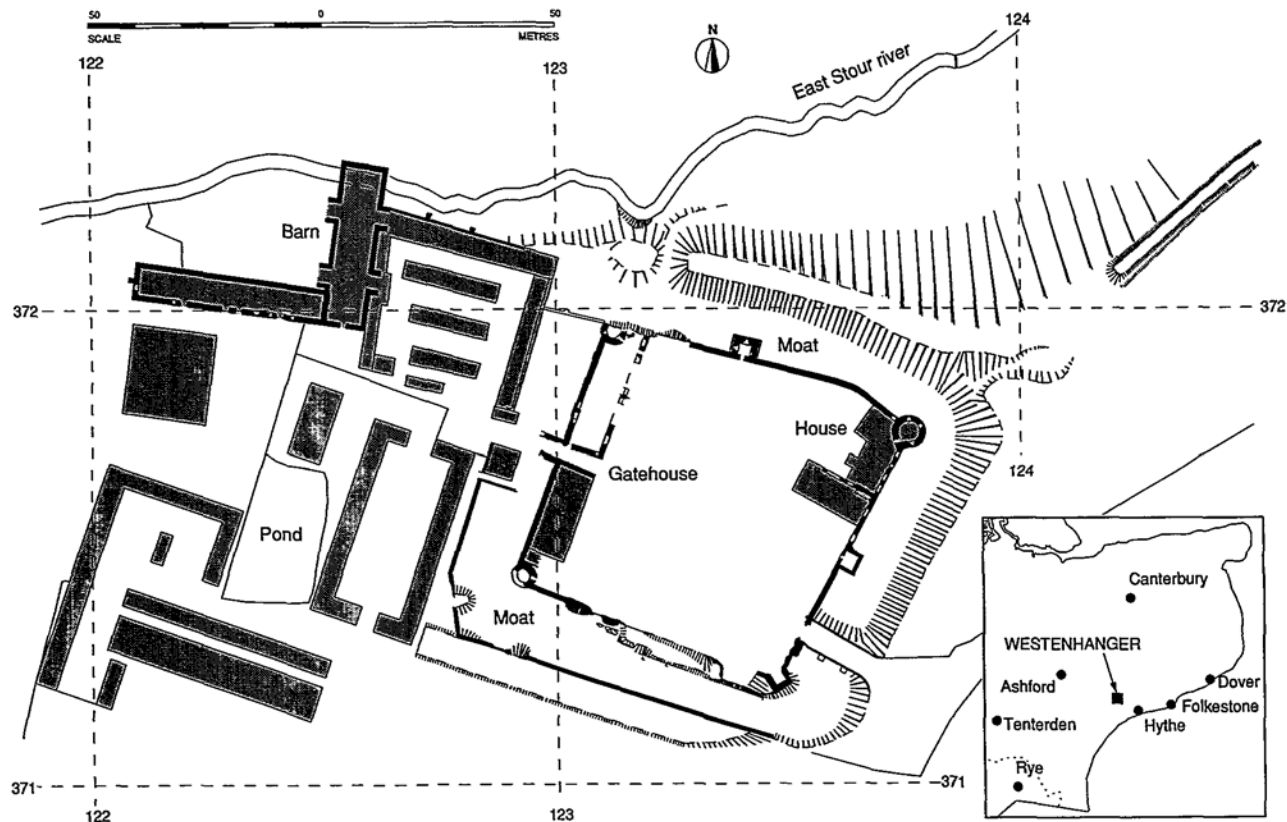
Outline site plan showing the location of buildings and earthworks, 2000
